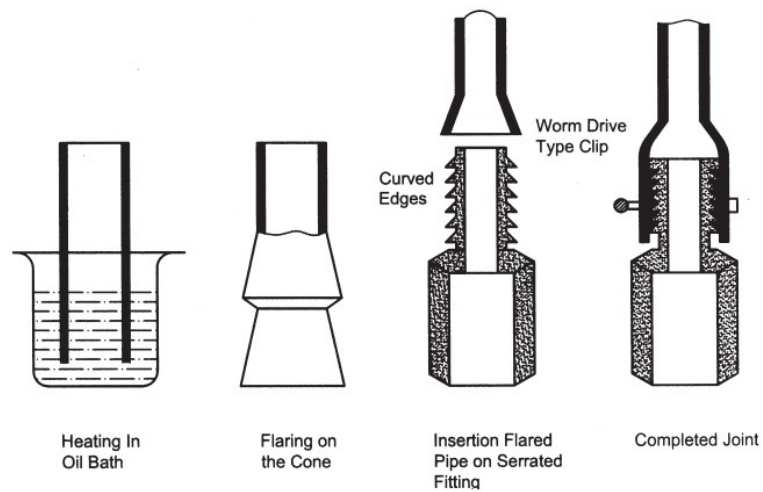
Typical Illustration of Making Insert Type Joints for PE Pipes
